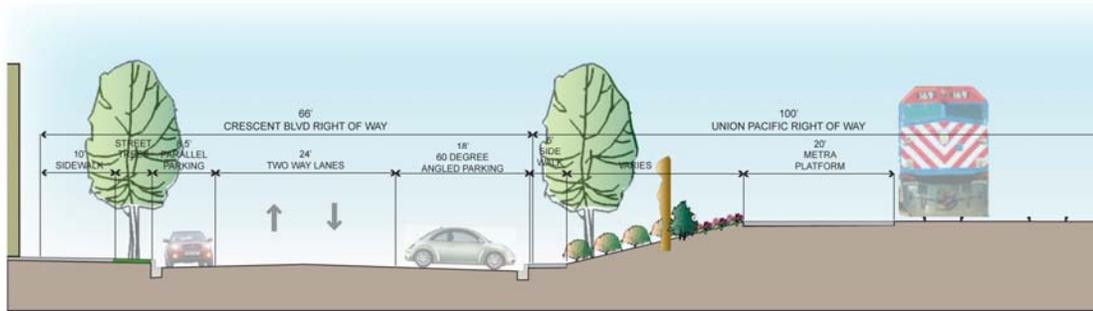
Cross-Section – Crescent Boulevard Adjacent to a Platform
